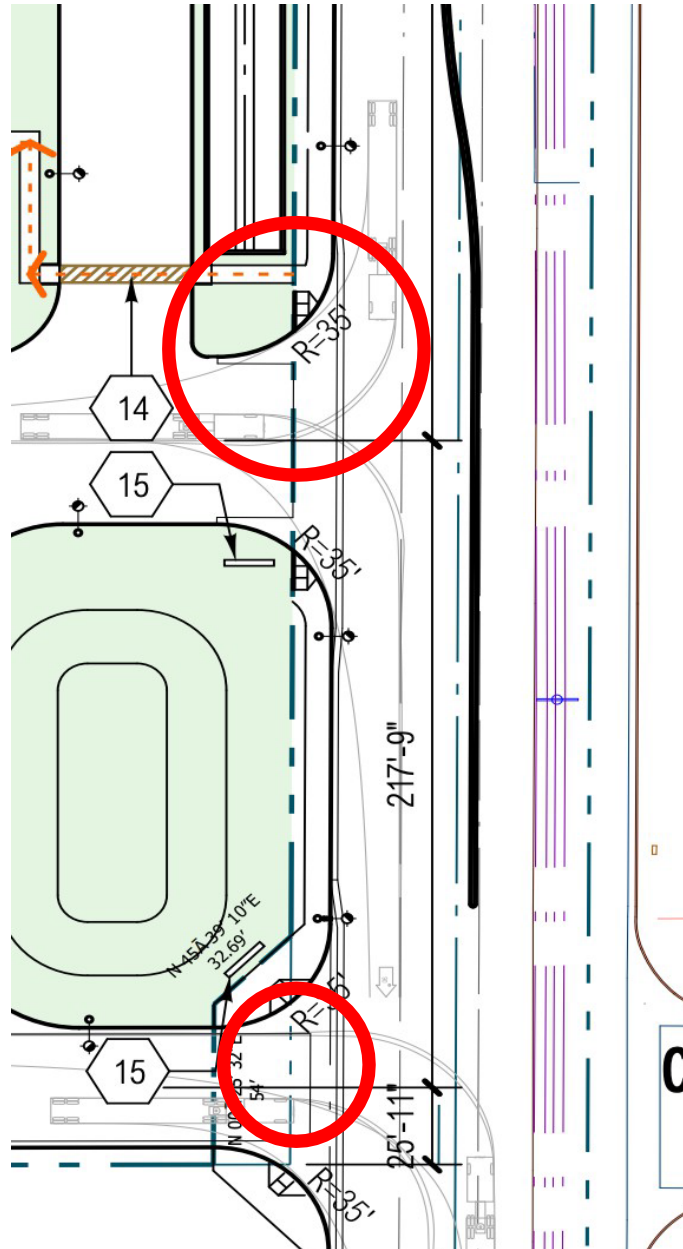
(Building 1) and Exhibit 2.9 (Building 2) depicts there is not adequate maneuvering and queueing space for trucks/trailers at the intersection of the project driveways and the adjacent streets. For example, trucks exiting the Building 1 site via the northernmost driveway on Indigo Avenue require additional maneuvering space across the centerline of each street, meaning that the truck will need to drive on the “wrong side” of the street into oncoming traffic in order to leave the site. The width of the driveway cannot accommodate the turning maneuver as the truck is depicted to turn onto the adjacent landscaped area.
